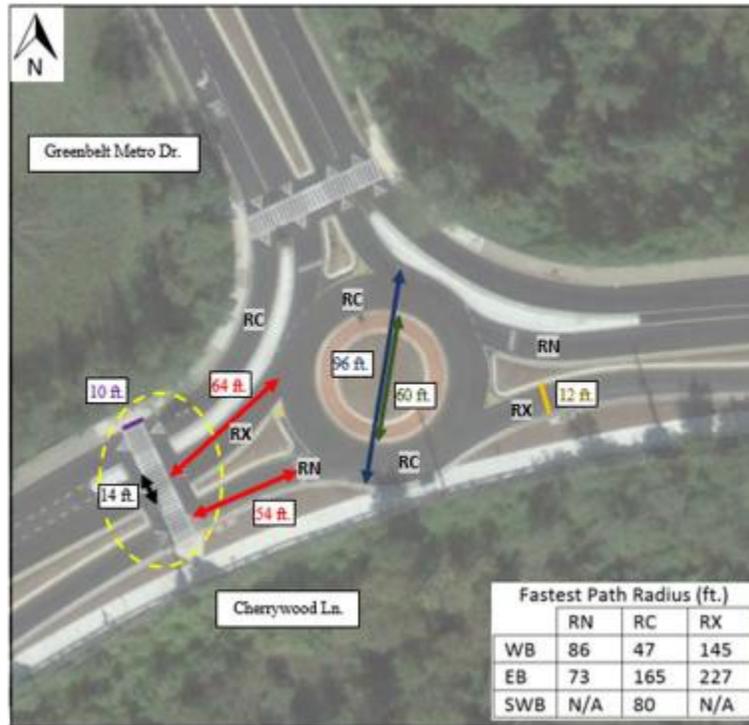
Roundabout at Cherrywood Lane at Metro Access Parkway, Greenbelt, MD
